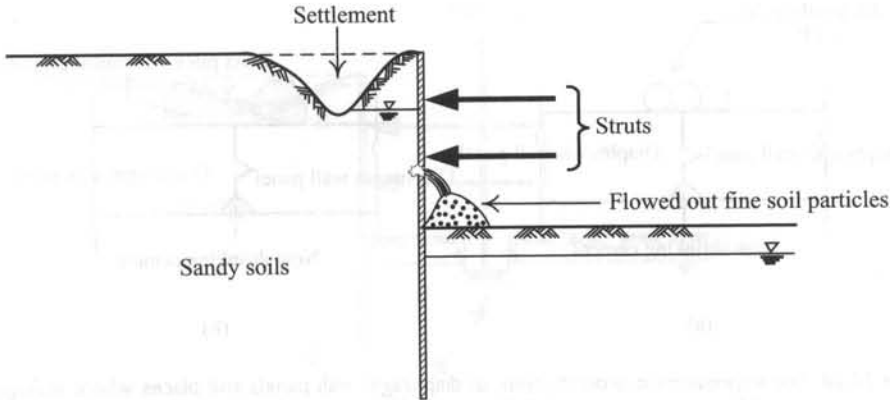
Ground settlement induced by leakage in the retaining wall.
